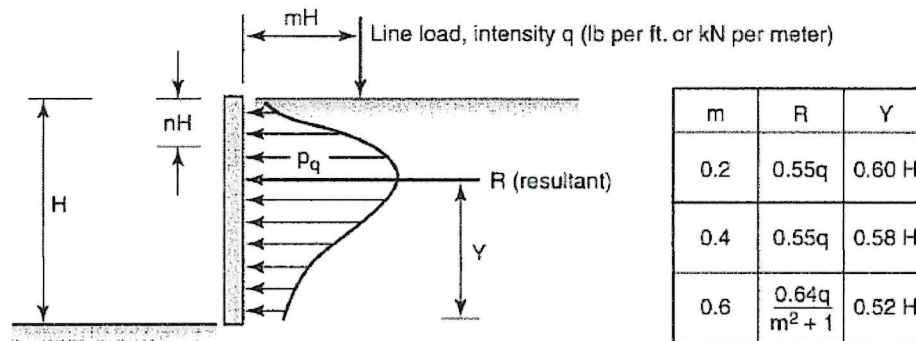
Pressure distribution against vertical wall resulting from line load of intensity q .
